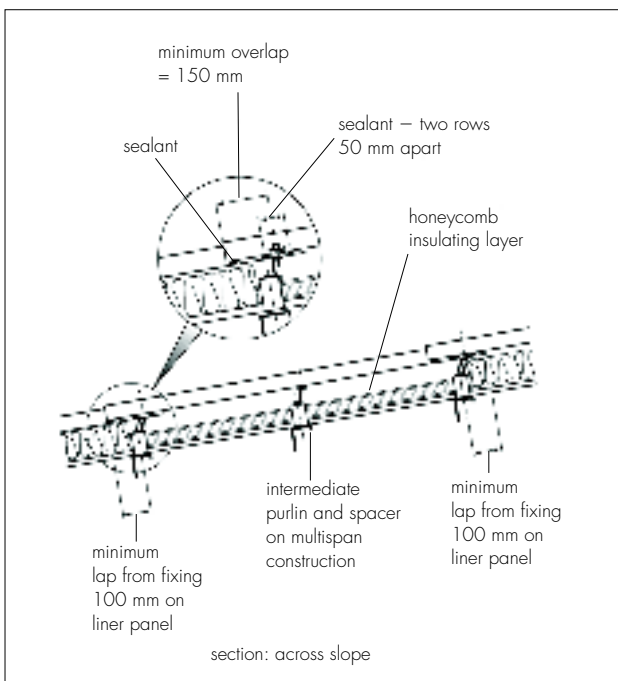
Fixing detail for site-assembled rooflights — side laps, underlap/overlap
